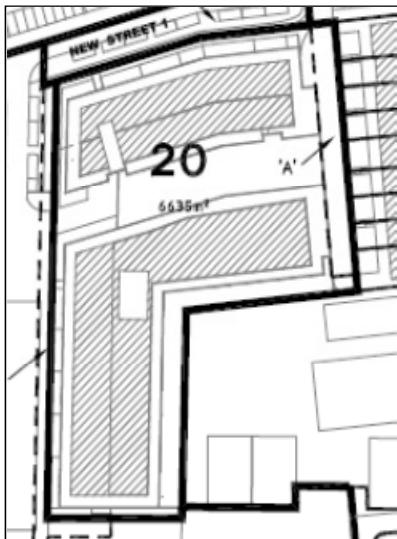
(above): The proposed subdivision allotment of Building E and F (surrounding the footprint of Building E and F) is identified as future Lot 20 as part of the Park Grove ‘Masterplan’
